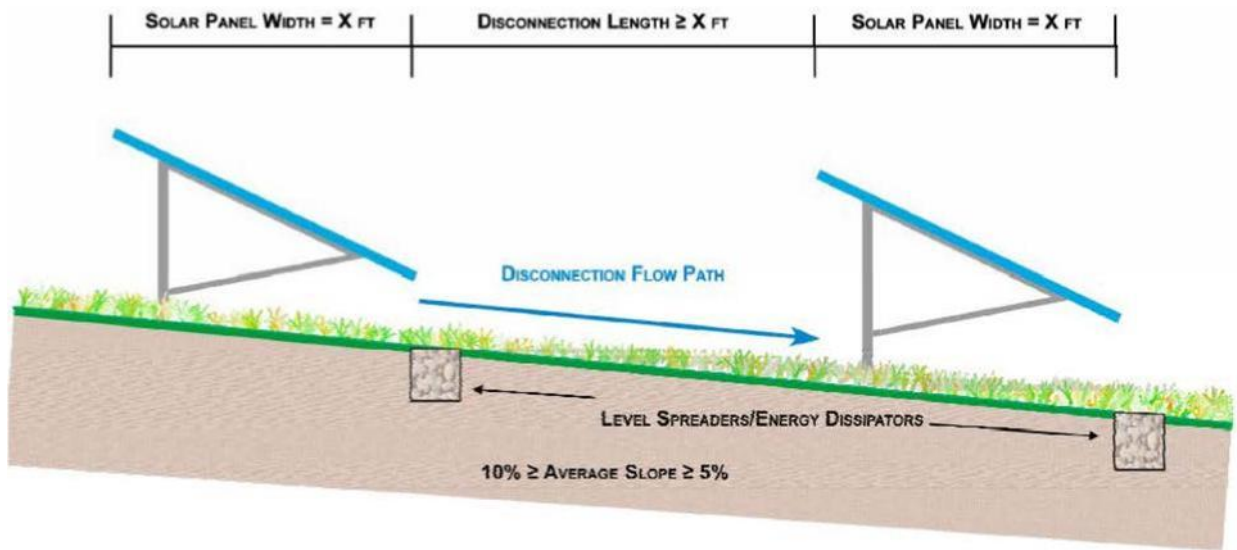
Typical Solar Panel Installation with Slopes > 5% and ≤ 10%
